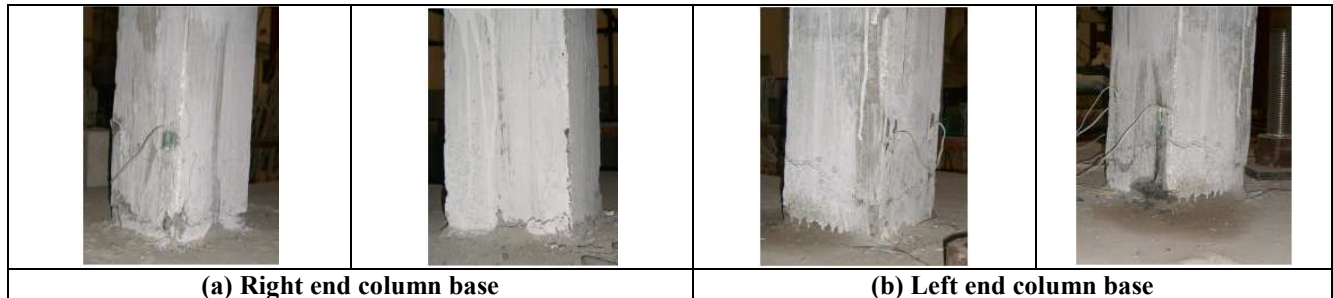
Damage photos at column base sections in PFT at +32kN (Push) at frame top
